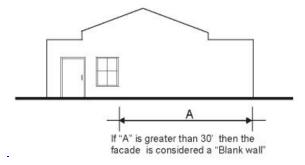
(D): Example of a blank wall that must be modified or otherwise altered under the provisions of this subsection.
